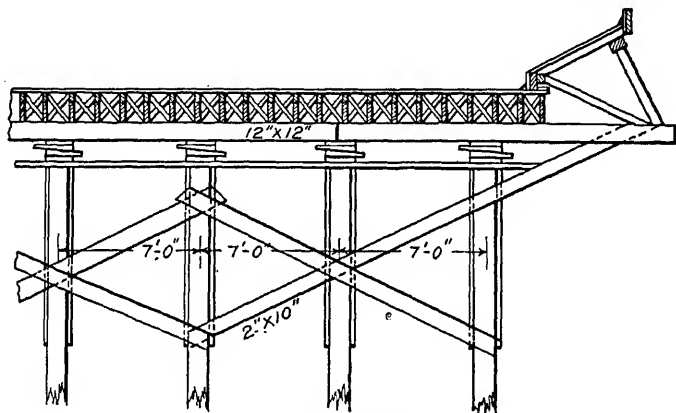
Centers for Bridge at Canal Dover, Ohio
